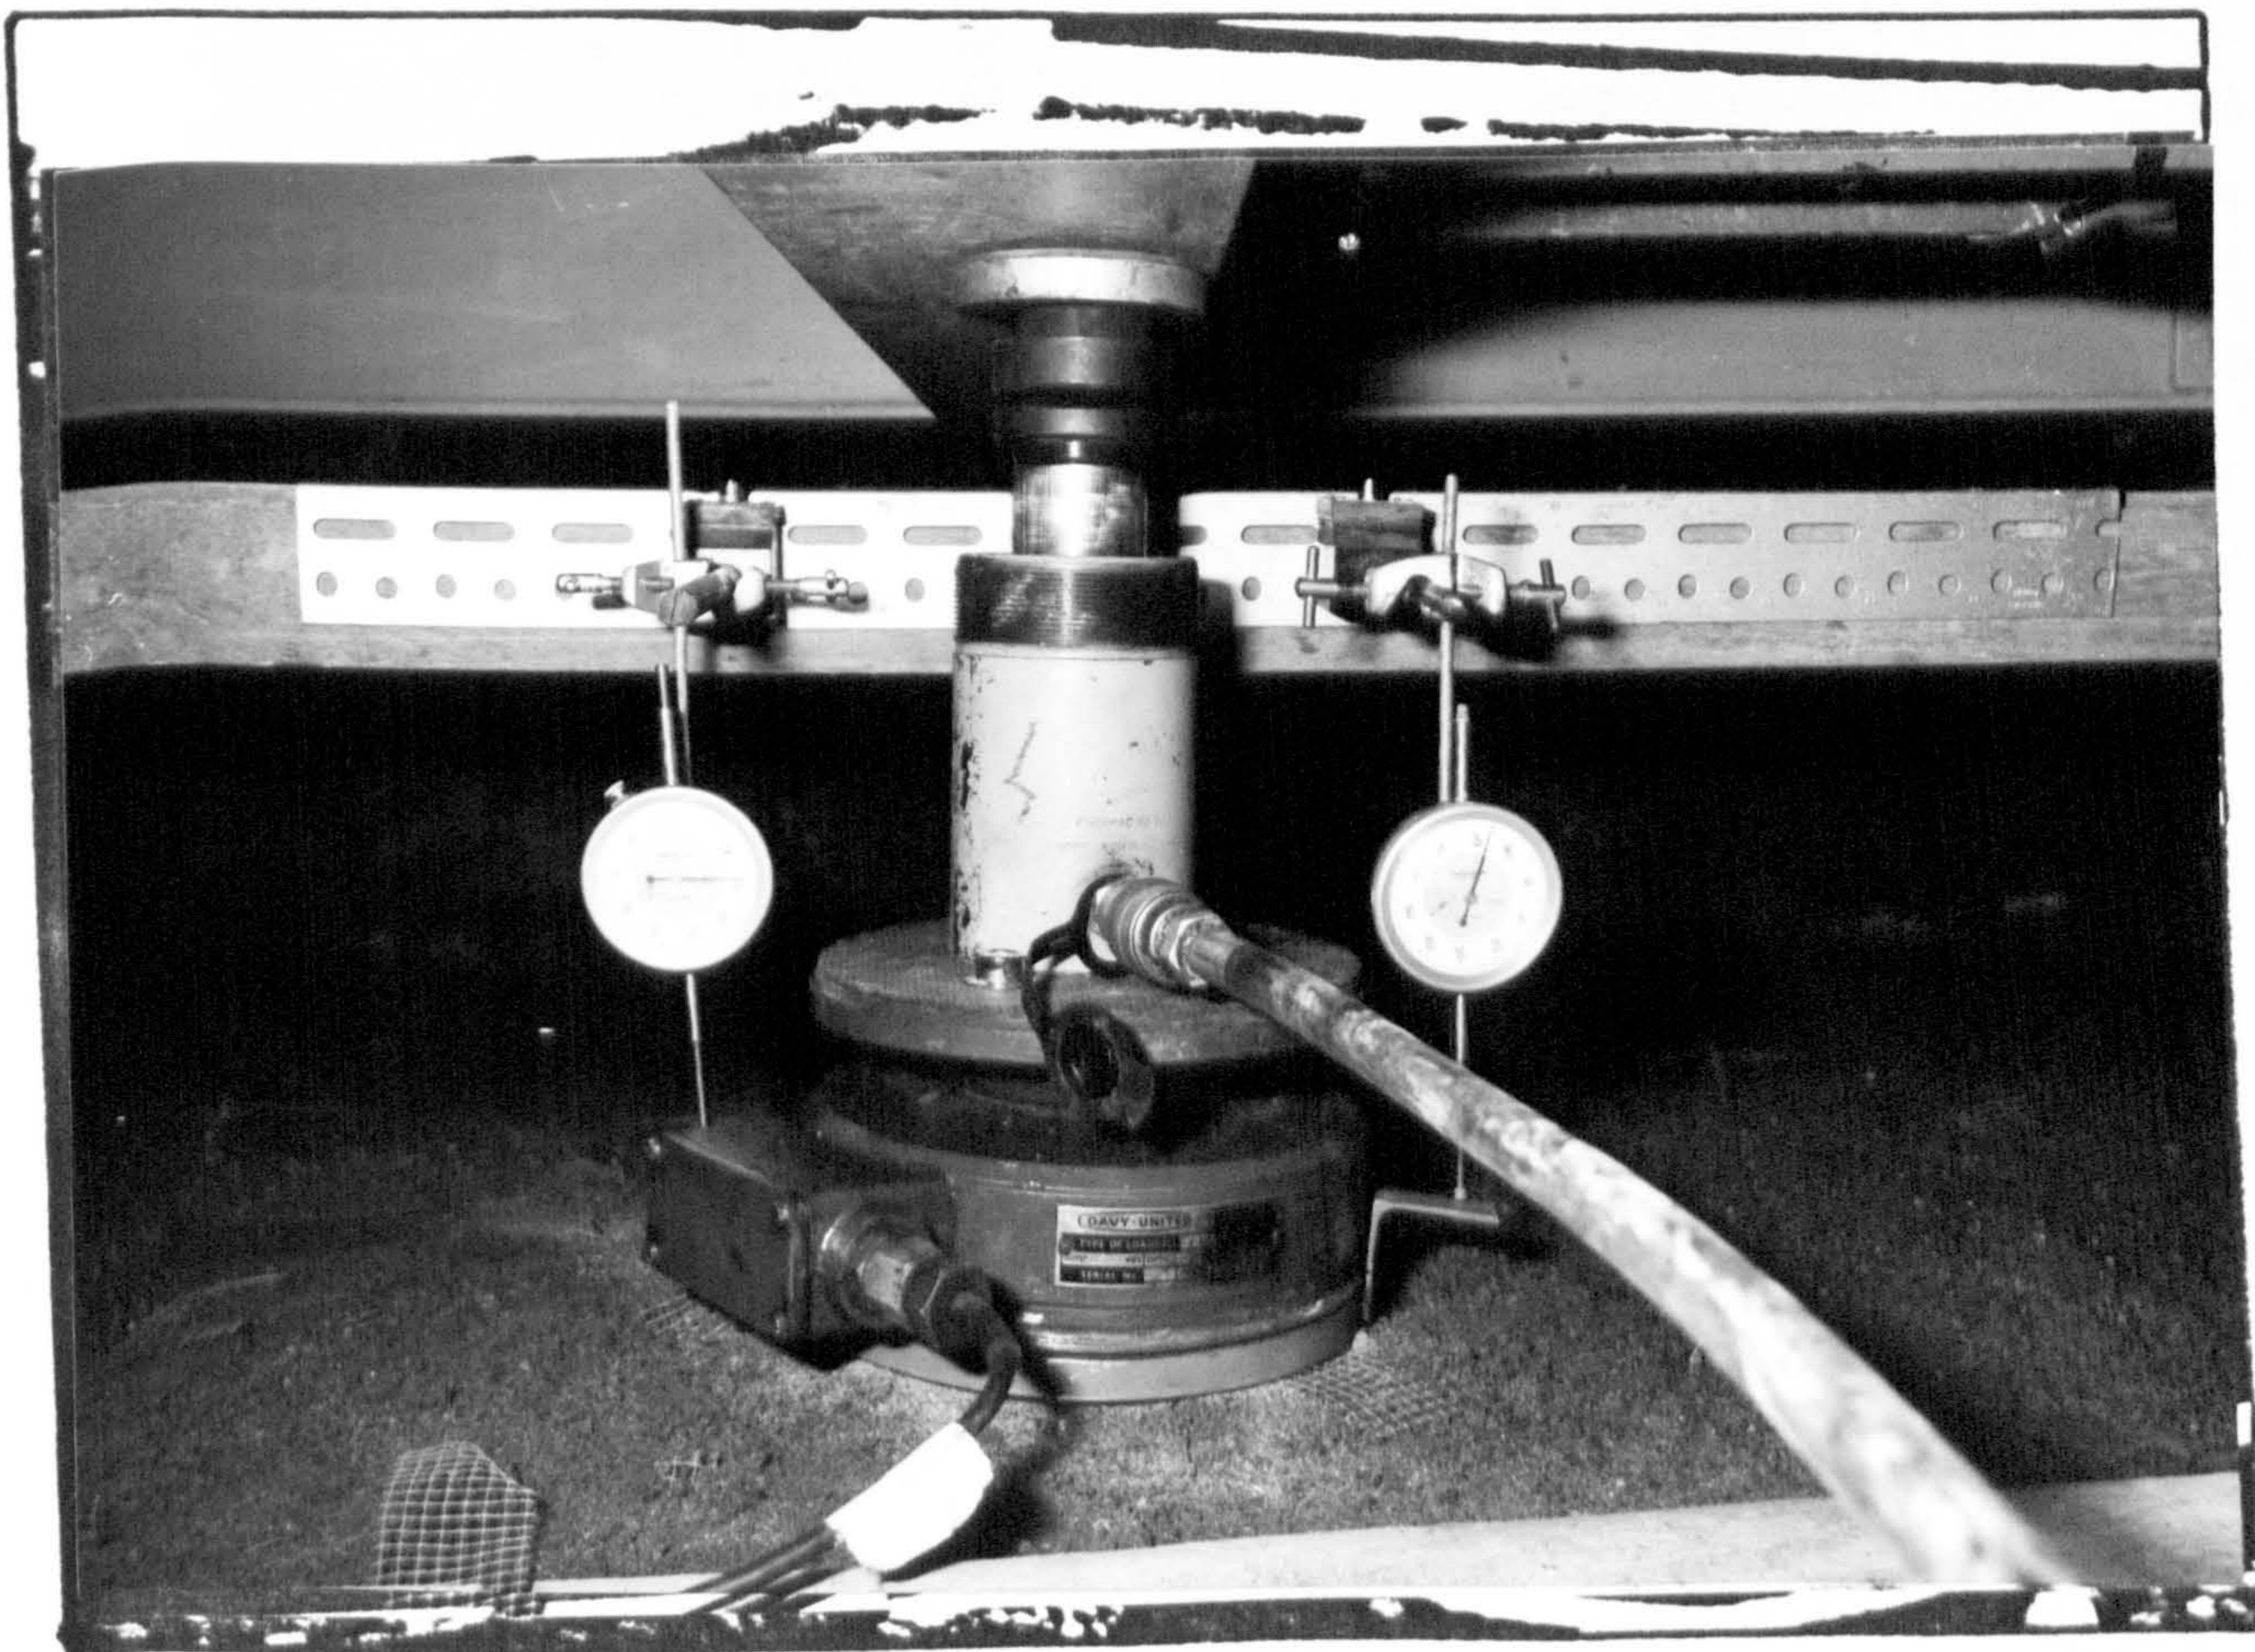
A View of Plate and Hydraulic Jack Under The Kentledge
